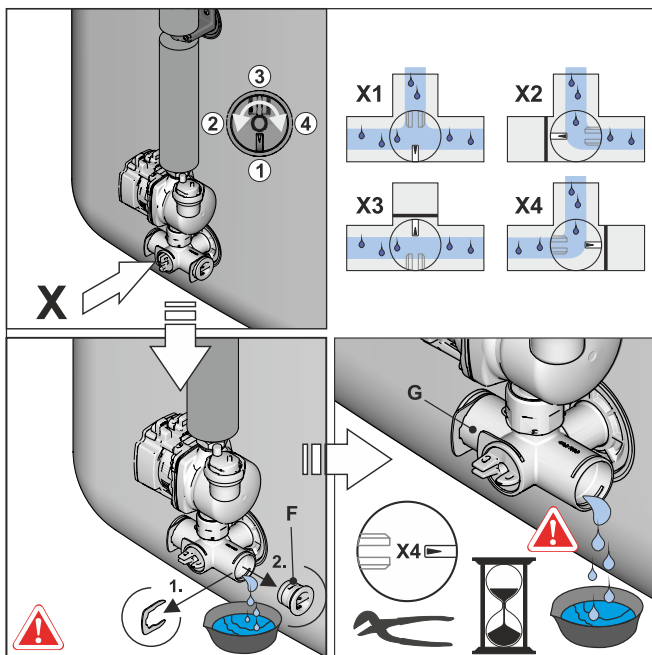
Shut off the valve insert, remove the blind plug from the connection bracket
